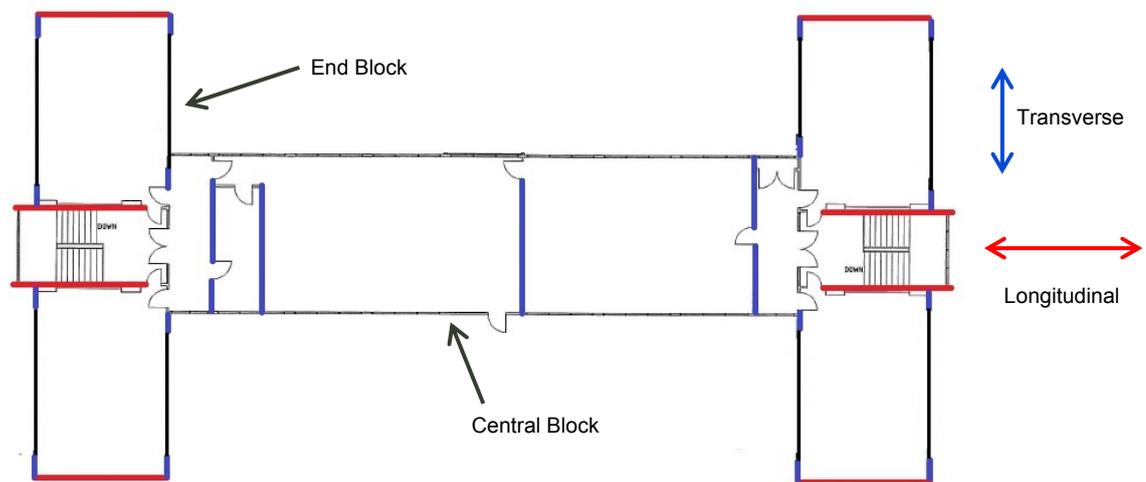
Typical Nelson Block Bracing Layout - First Floor
